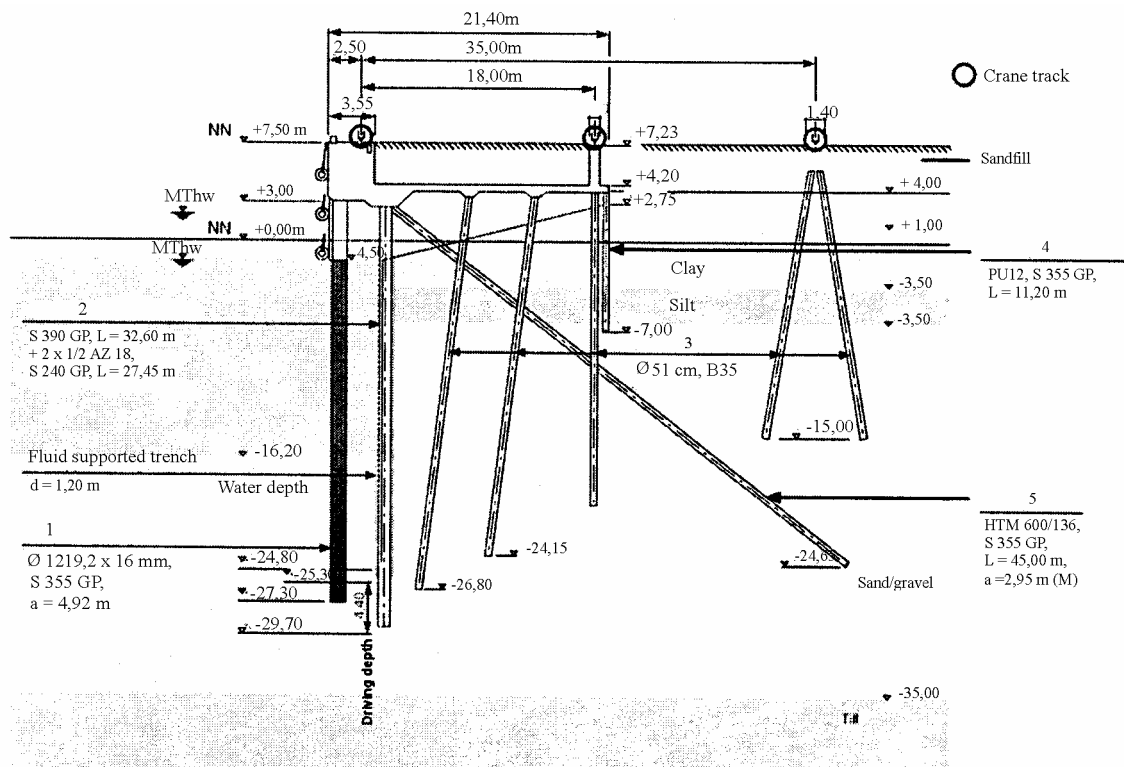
Combined sheet pile wall: 1-fender piles, 2-combined sheet piles, 3-prefabricated concrete piles, 4-sheet piles, 5-anchor piles (Miller, 2003)
